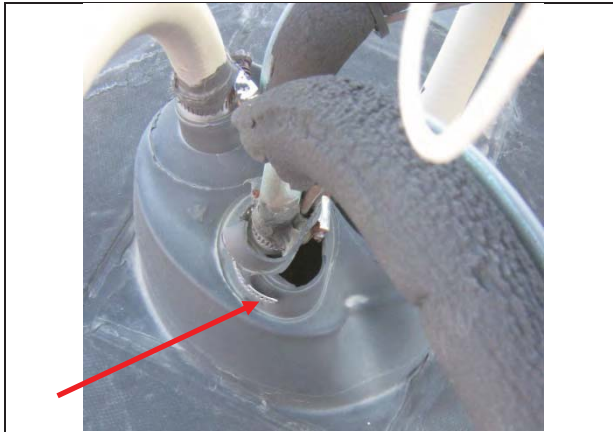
separation of roof membrane at refrigerant line penetration of roof.
